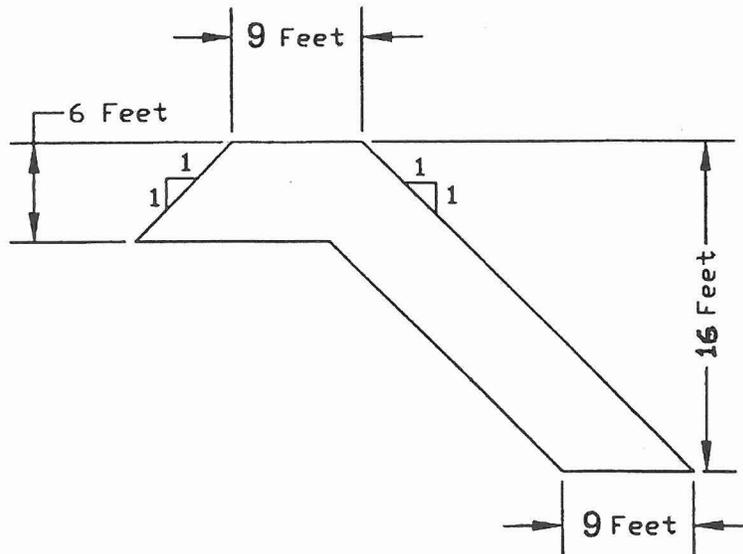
Typical cross section of soil cement grade control sill in overbank area, with a downstream toe-down depth of 16 feet. Within low flow channel, the toe-down depth should be 27 feet.
